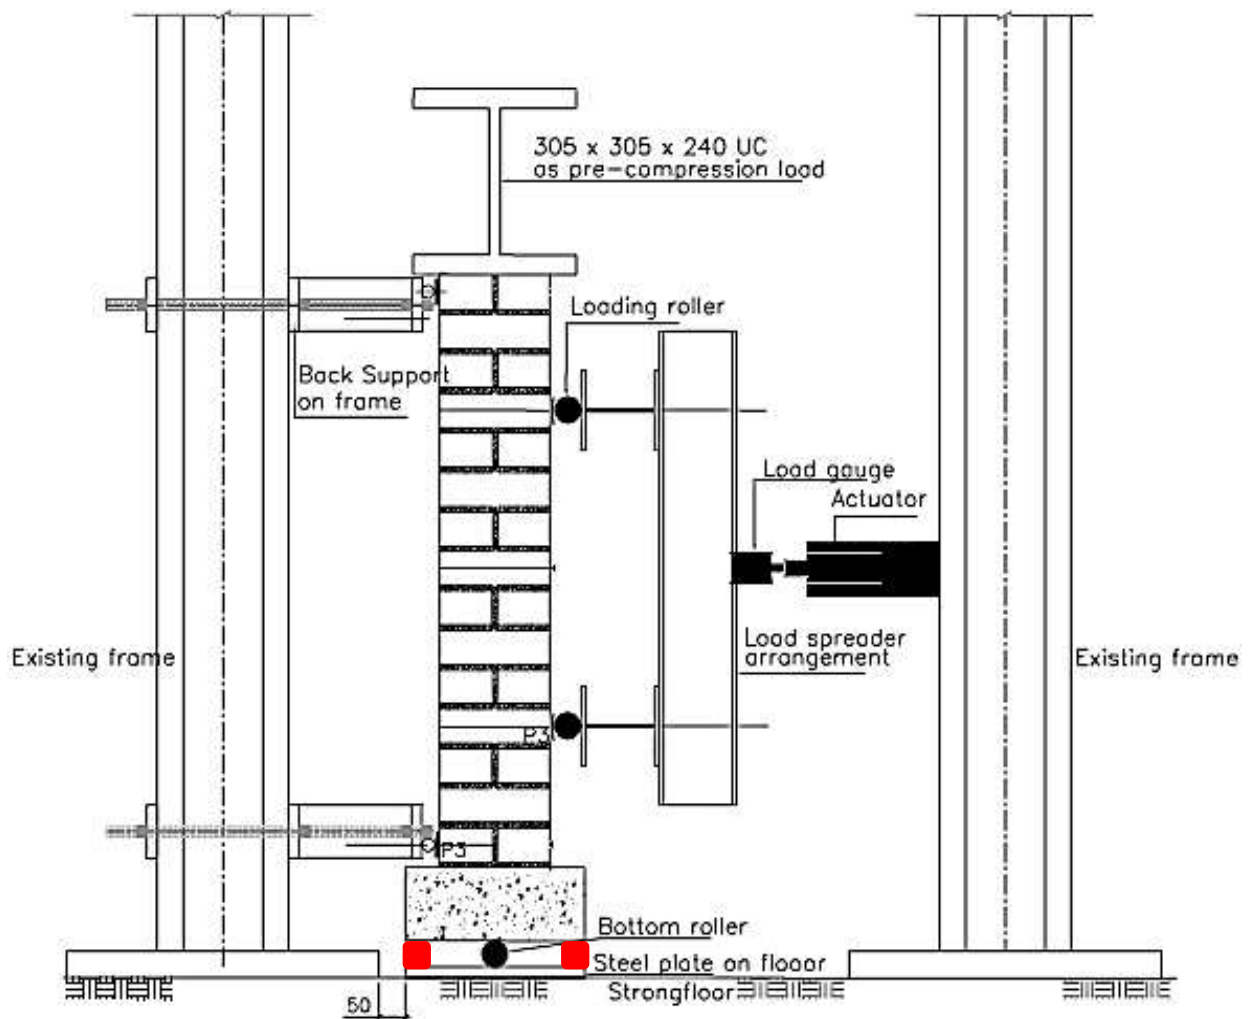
Out-of-plane testing arrangement (drawing scheme)
